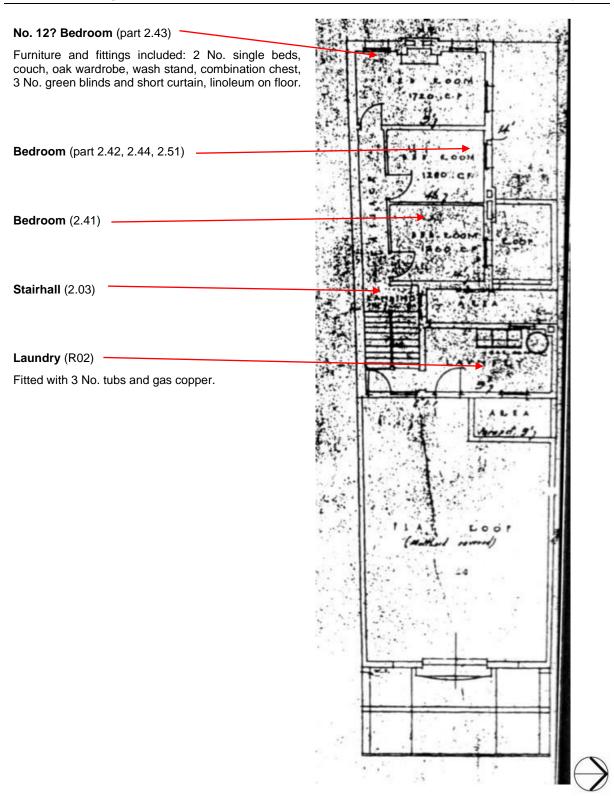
Fortune of War Hotel, 137 George Street, original roof floor plan and second floor (rear) plan. While sections of the original internal walls to the rear of the building (the bedroom area) remain, the area has been altered to accommodate the mid 1980s fire stair, two en suite bathrooms and a store cupboard. Many of these changes were the result of inserting en suite bathrooms in the late 1980s. The stair hall (2.03) remains substantially intact, and the passage (2.40) that connects it to the rear of the building retains much early fabric. The plan of the laundry and roof terrace today is generally as shown in this plan. Notes in italics are those taken from the survey and reproduced in the Clive Lucas, Stapleton and Partners Conservation Management Plan of 1999. Source: City of Sydney Archives BA86/1920.
